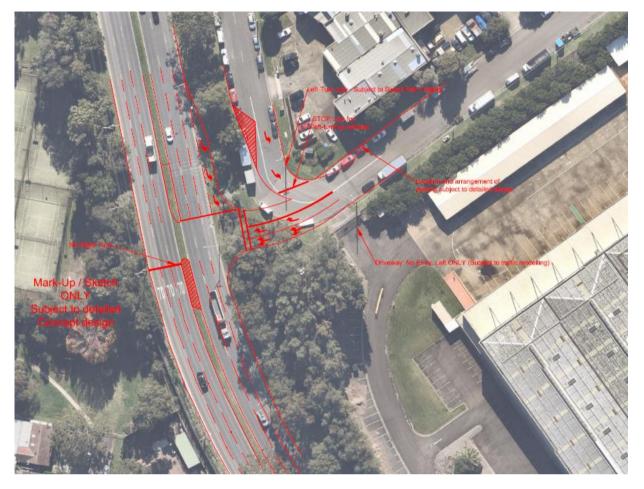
Sketch of potential new intersection at Endeavour Road and Captain Cook Drive (base source: Planning Proposal)
